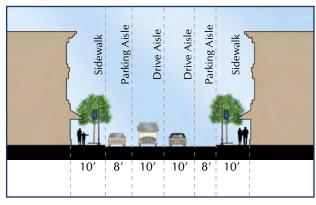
Section 2: Typical Mixed Use Core Street - Parallel Parking
